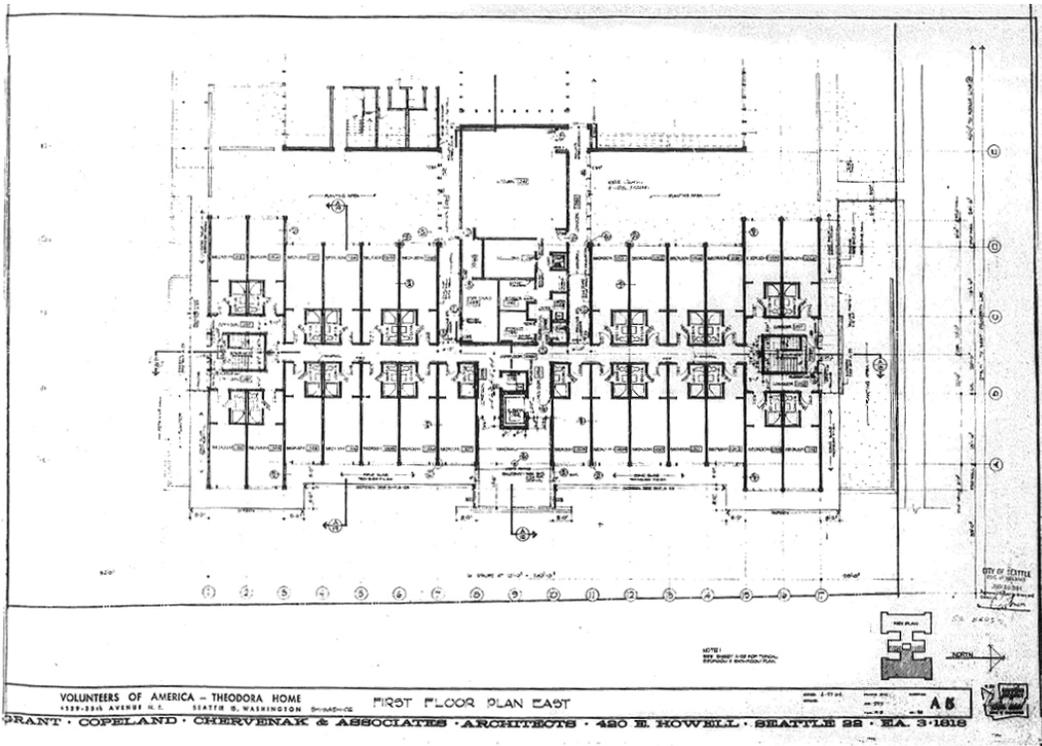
Original First Floor Plan East (Seattle Department of Planning and Development archives)
